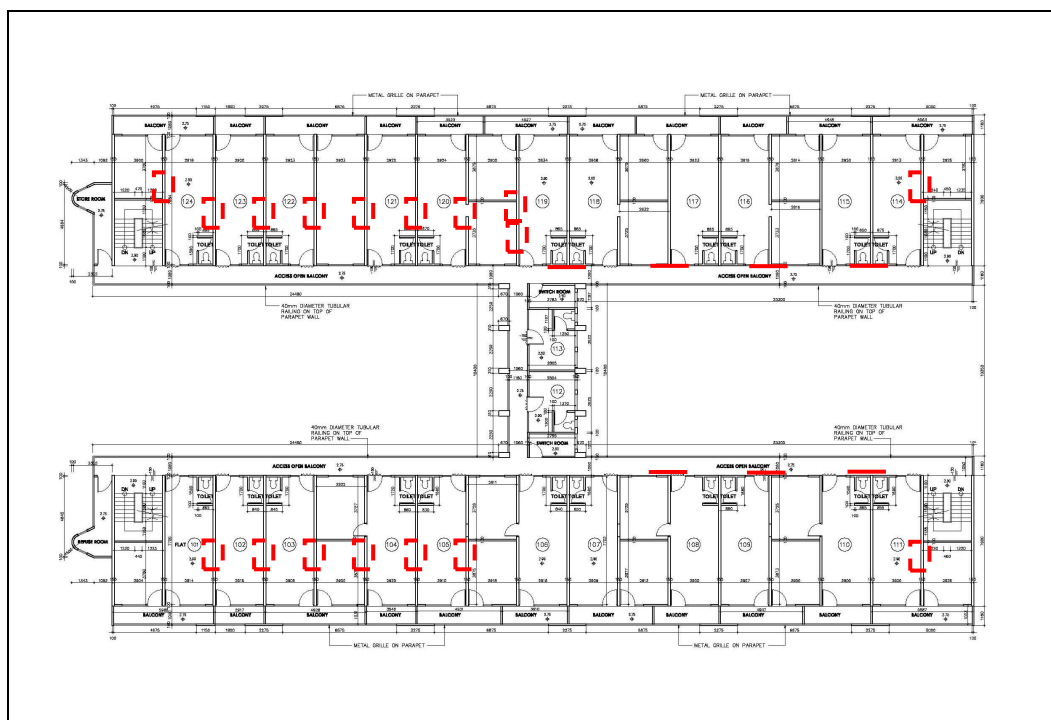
Existing ground floor plan (new openings to be formed in the internal cross walls boxed in red)
